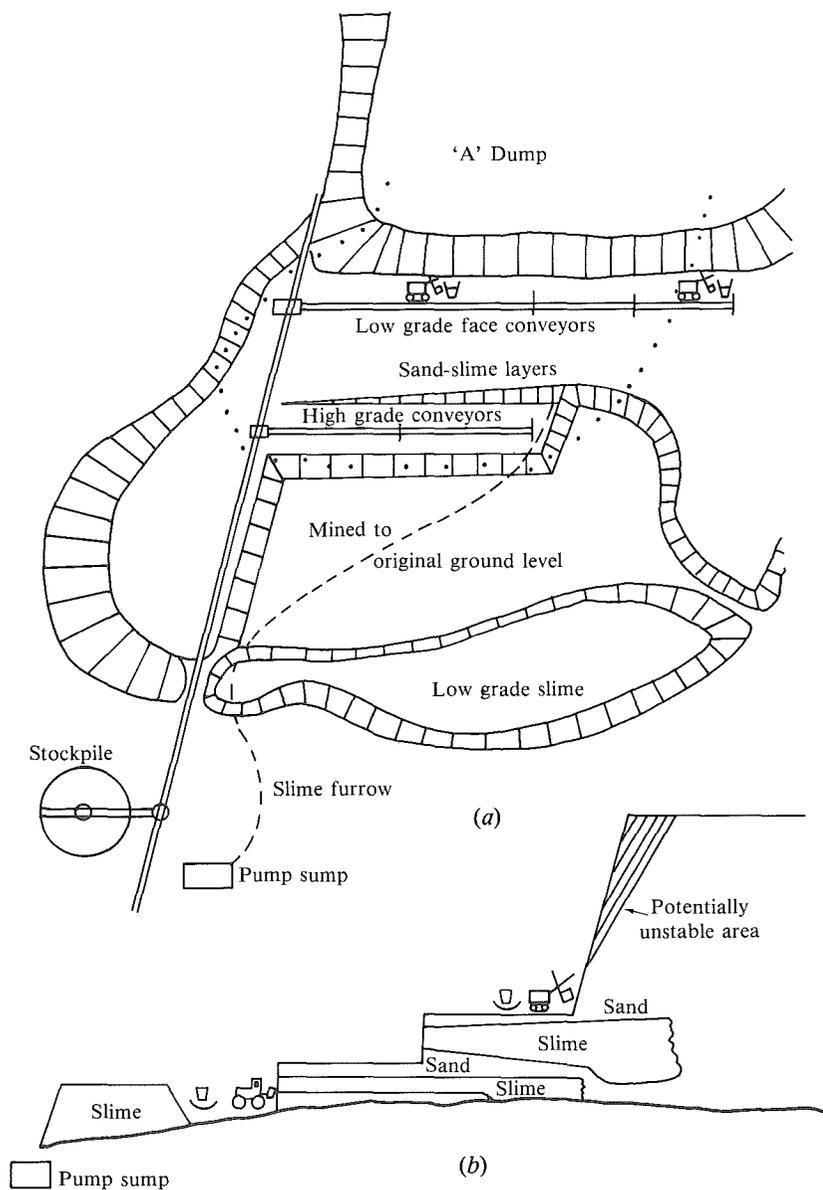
a, Plan of reclamation b, Elevation of reclamation.
